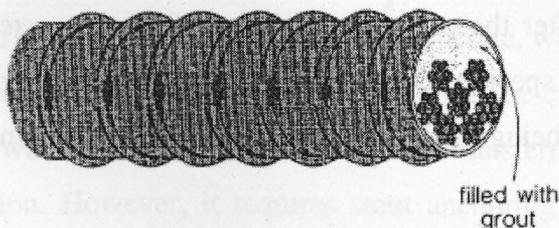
Bonded tendons – grouted, corrugated metal sheath containing bonded multi-strand tendon [4]
